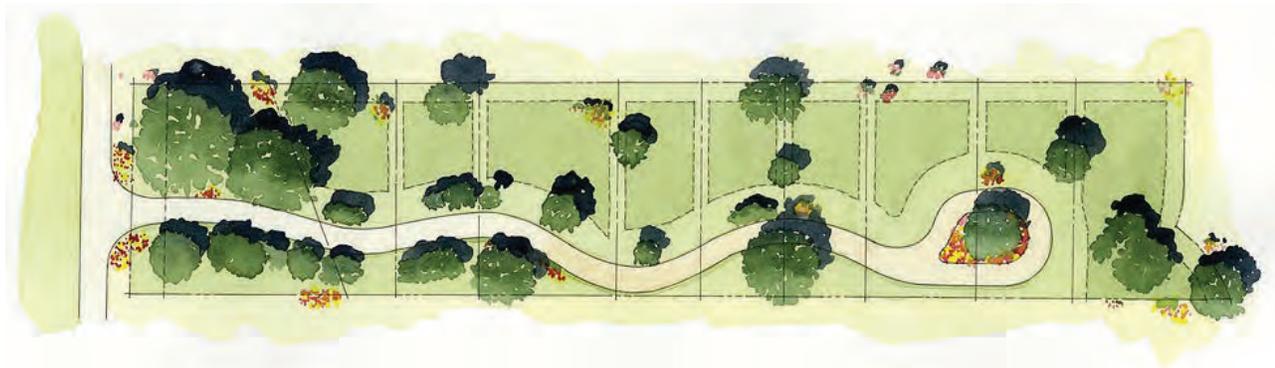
Site plan for Fox Hollow (Source: Robinson Design Engineers)
